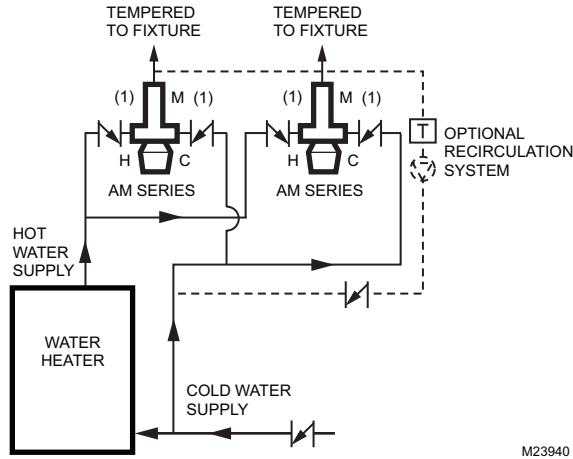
AM Series ASSE 1070 - Handleless Fixtures.
